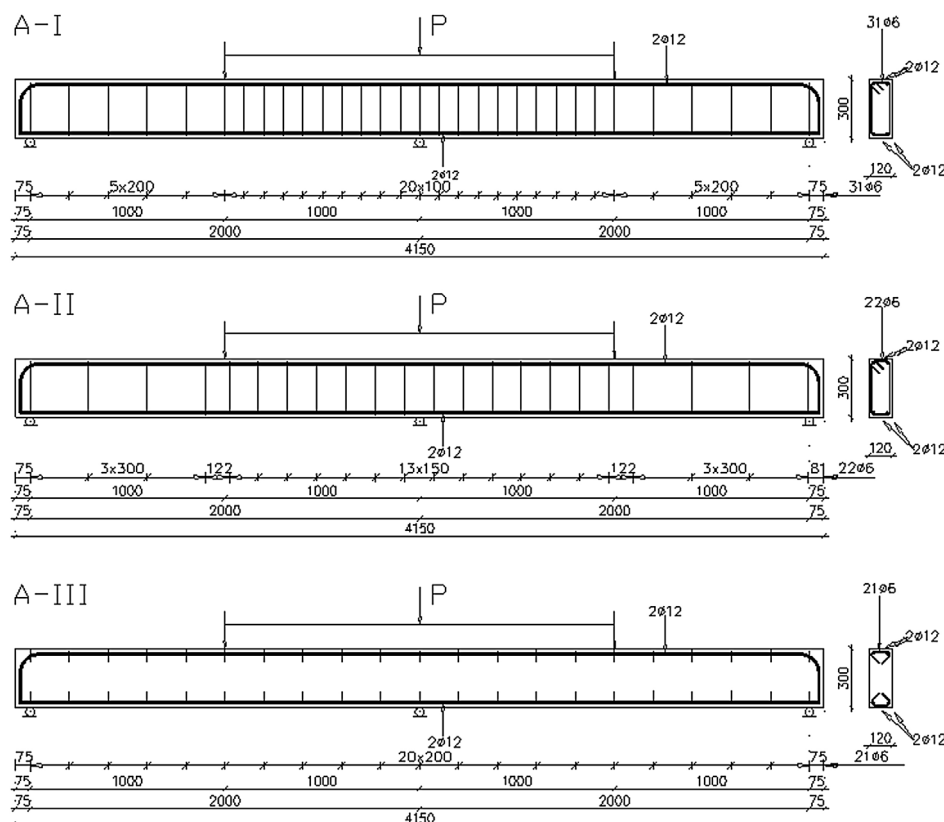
Longitudinal and transversal reinforcement in beams tested.
